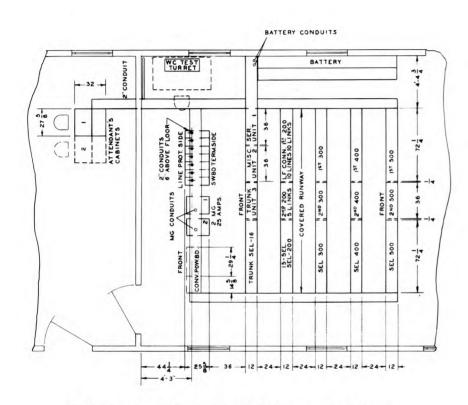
No. 1000 Switchboard - Floor Plan (North Electric Manufacturing Co.)
